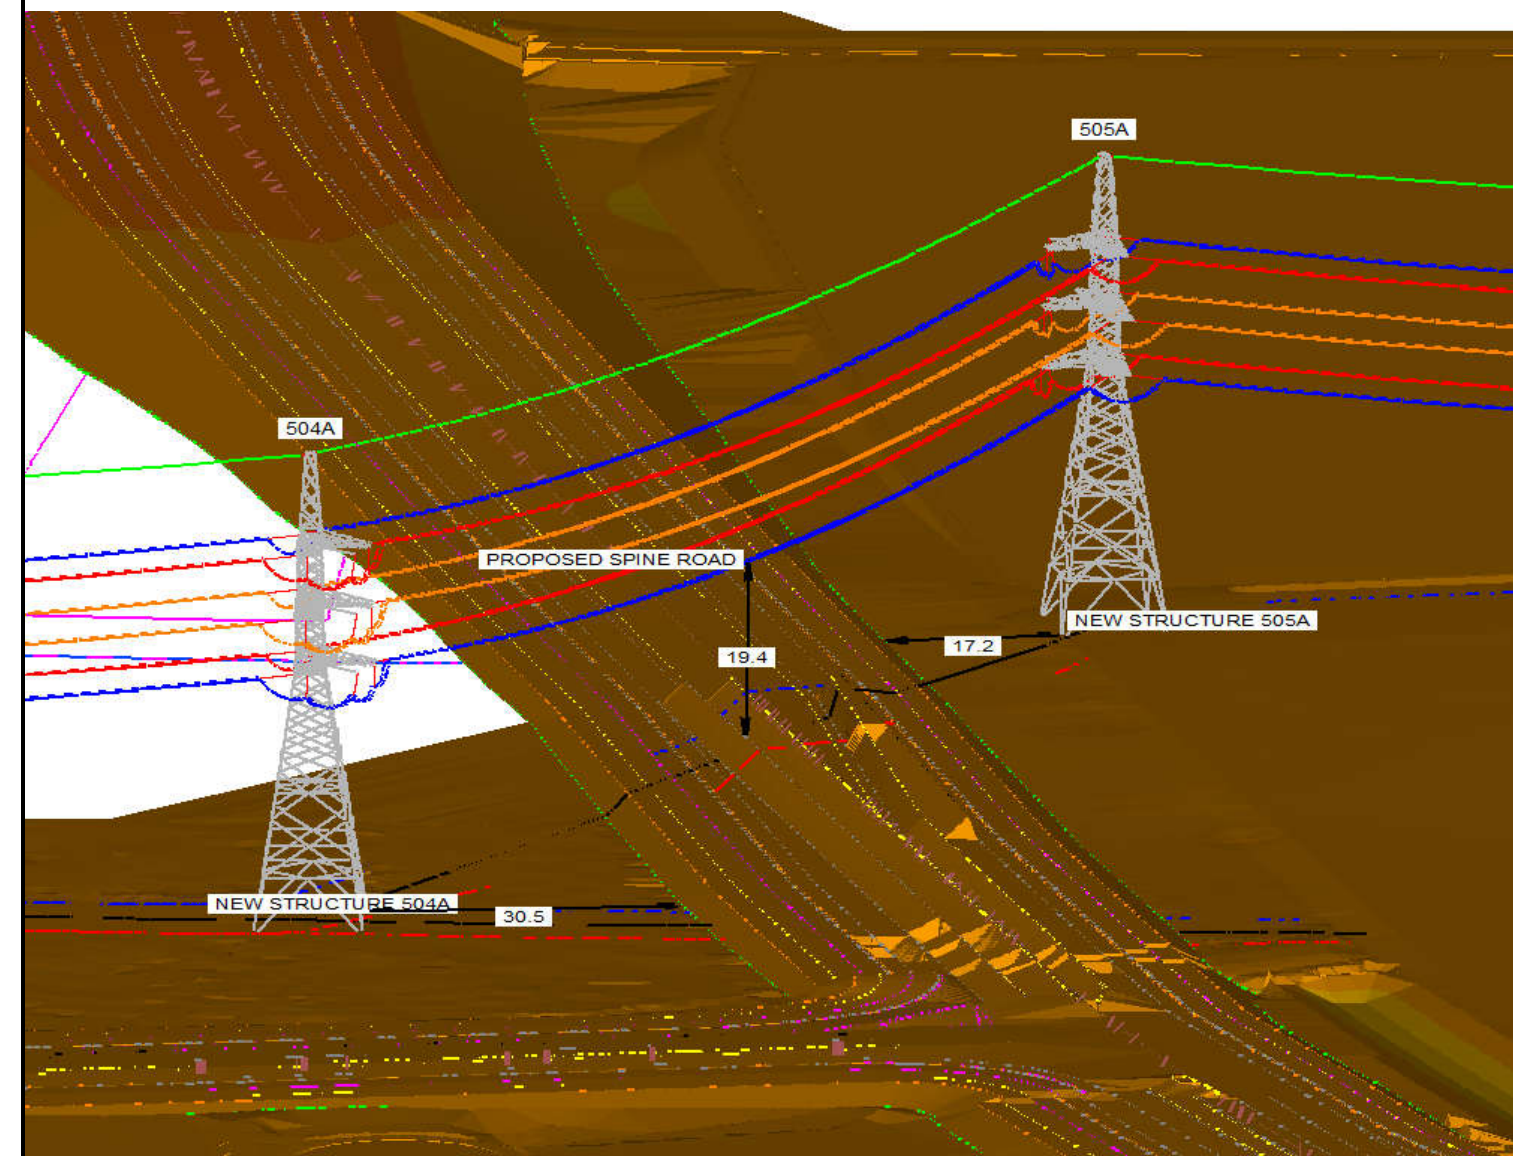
3D View showing 3D TIN surface of proposed TIN surface and proposed port layout area. As shown approx 19m clearance shown to Spine Road - noting is spikes in surface due to mixing multiple data sources to create surface.
